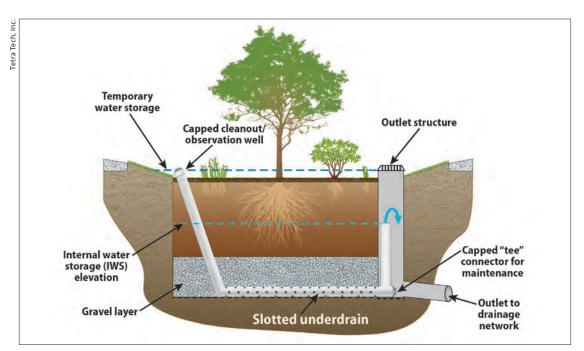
In this underdrain cross-section image, an upturned pipe design allows excess water to drain to an alternative drainage network while also ensuring a permanent internal water storage layer within the practice. An outlet structure can be included in the design to provide added protection against high volume flows.
